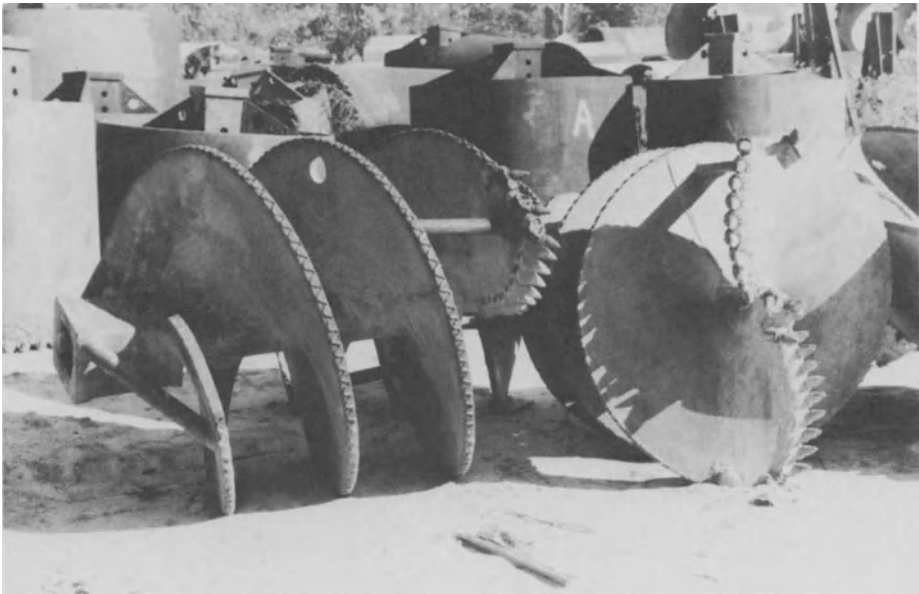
A large diameter earth auger, used in pier and caisson construction. [Ref. 14]
